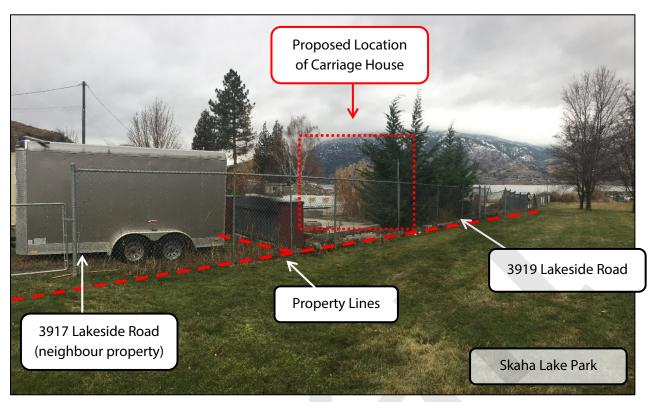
Looking south toward proposed siting of carriage house in in 3919 Lakeside Road
